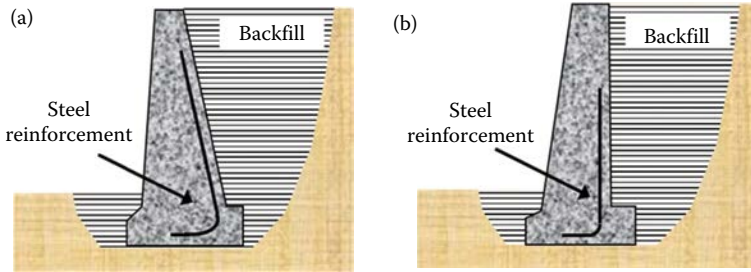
Typical semigravity concrete walls with steel reinforcement. (Credit: A. Braham.)
